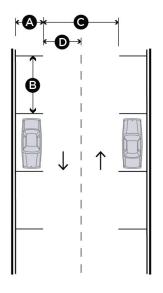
Off-Street Parking Space Minimum Dimensions
